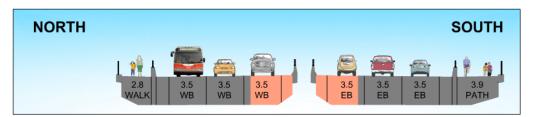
CP Proposed Stage 1 Bridge Cross Section
